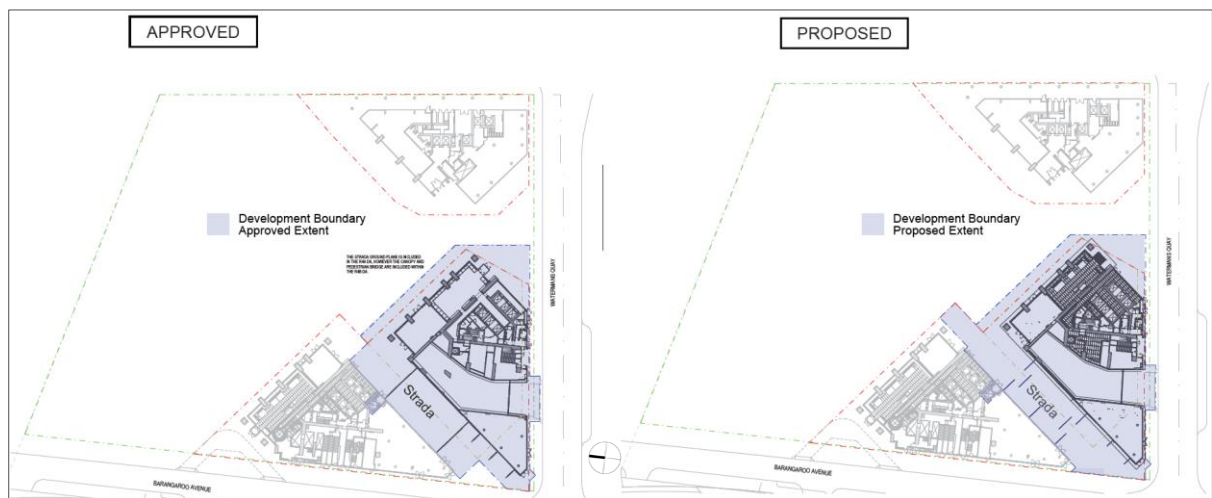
| Approved (left) and proposed (right) car park entrance of Building R4B
